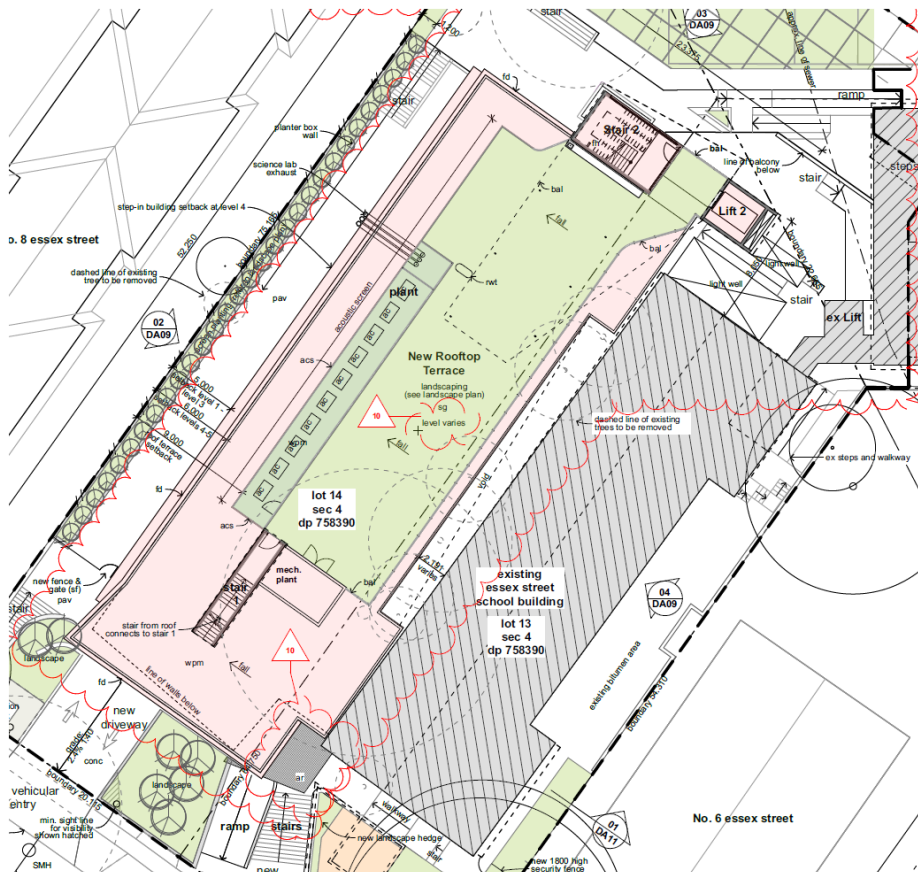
Proposed site and roof plan under DA/89/2017/C.
